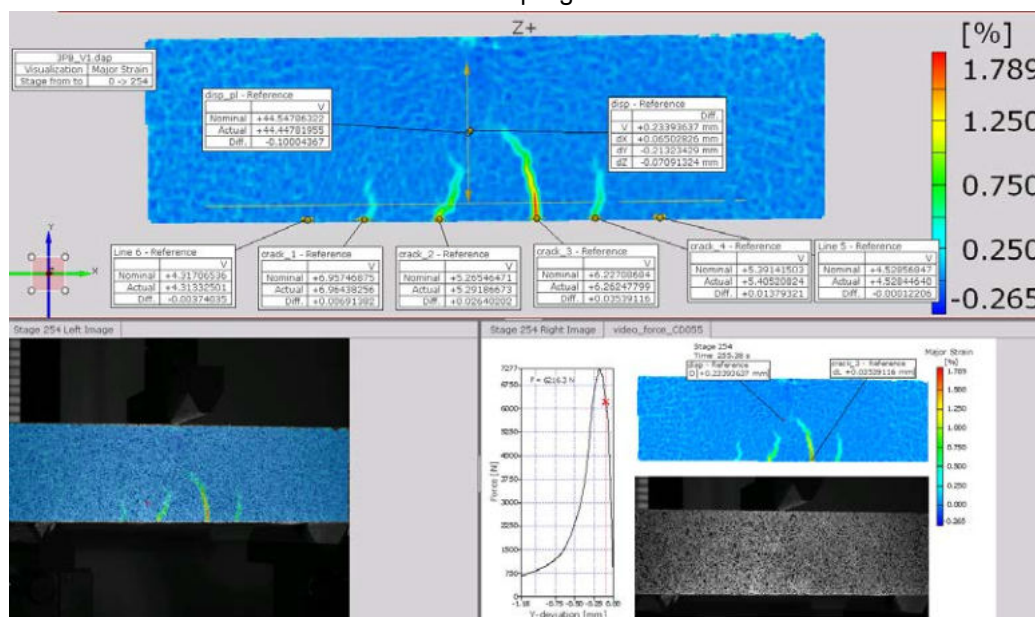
Use of the Aramis instrument during testing of bent beams fabricated from concrete reinforced by dispersed non-metallic reinforcement.
